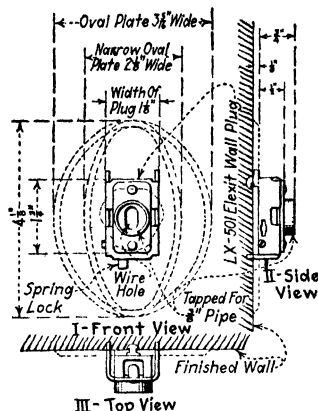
Dimensions of No. LX-501 wall plug installed on Elexit wall receptacle. No. LX-501 is tapped with a $\frac{3}{8}$ in. pipe thread for rigid attachment to bracket arms or center knobs. Can be wired through tapped opening or through side holes. *To Take Down Bracket*, slip canopy forward or unscrew center knob and release spring lock.
